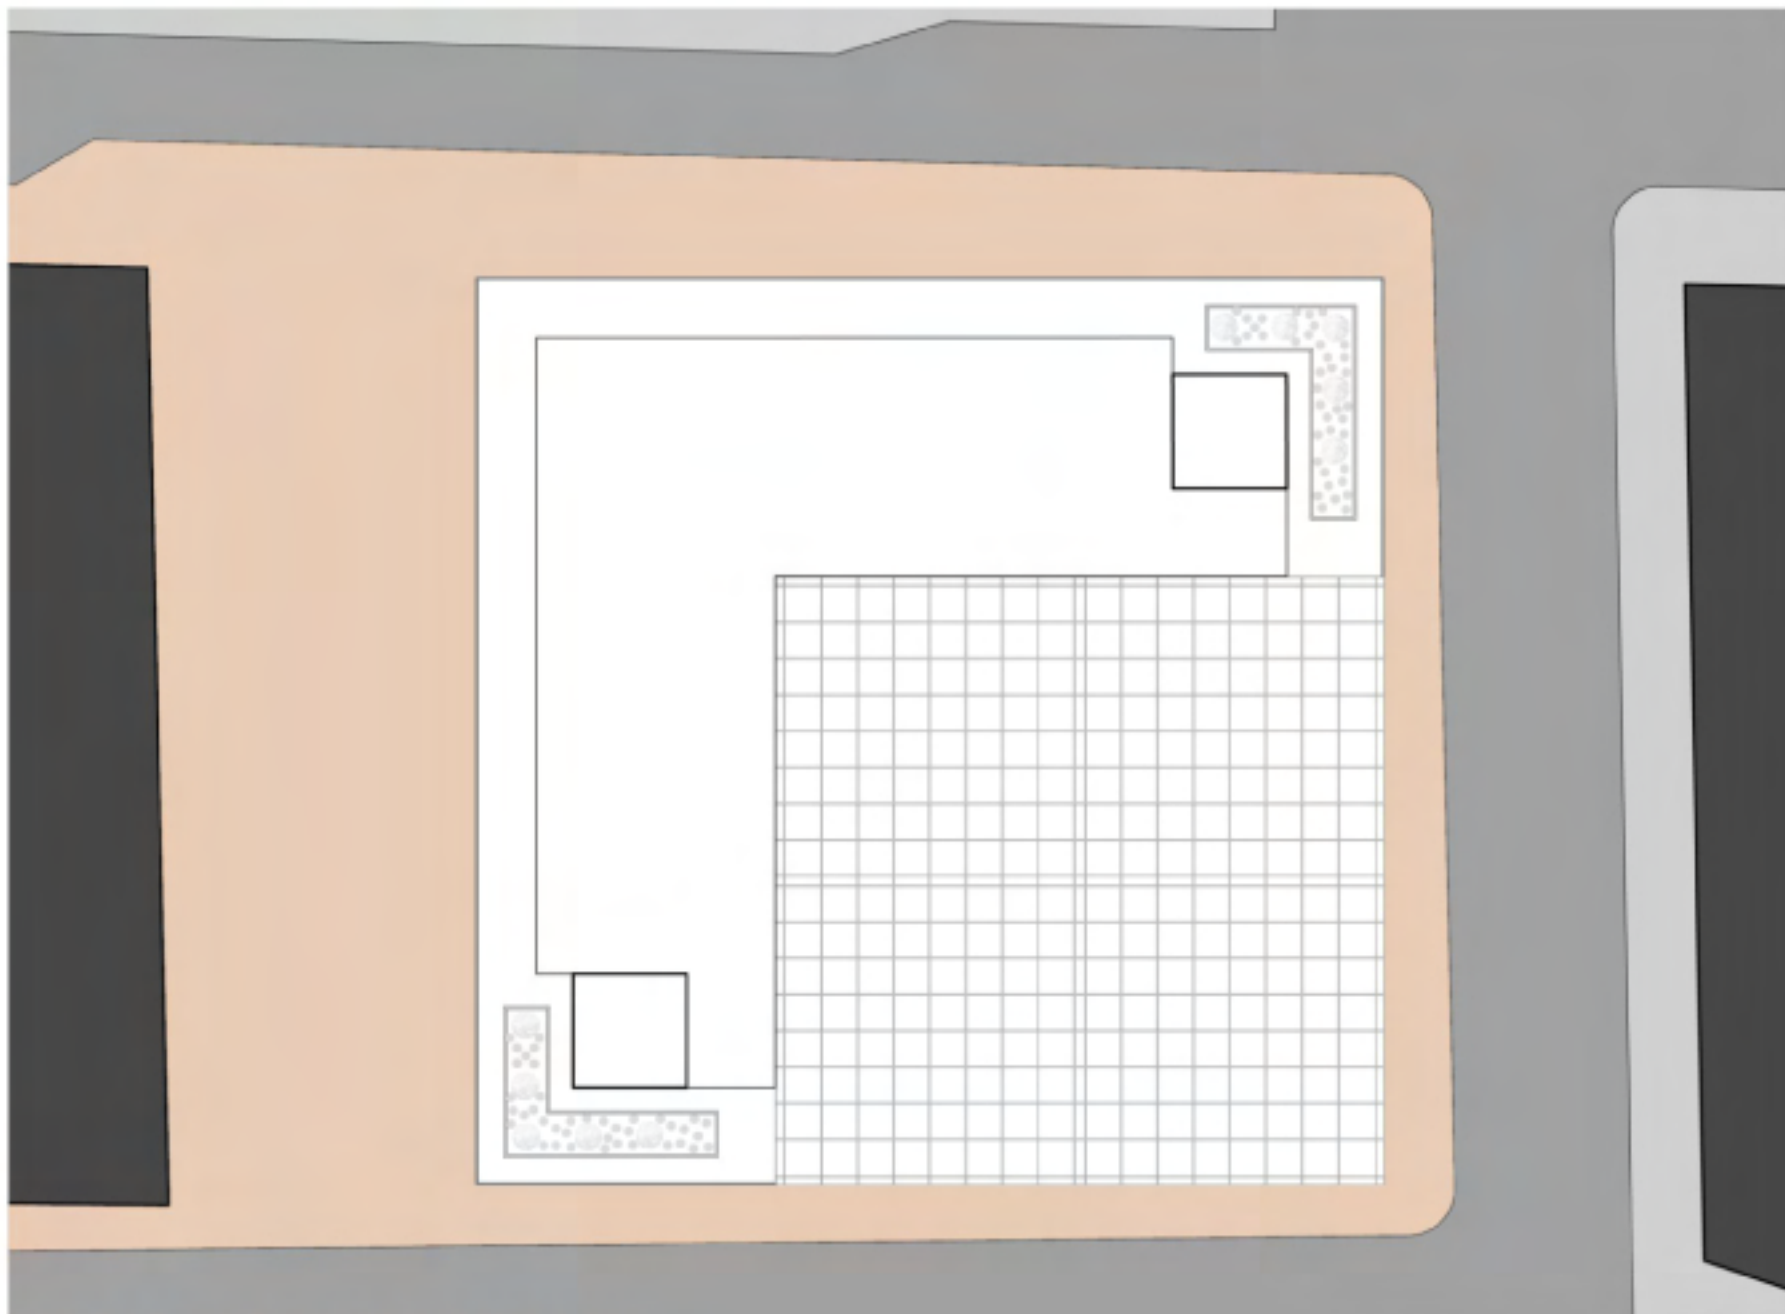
Roof Plan [Created using AutoCAD and Photoshop]
